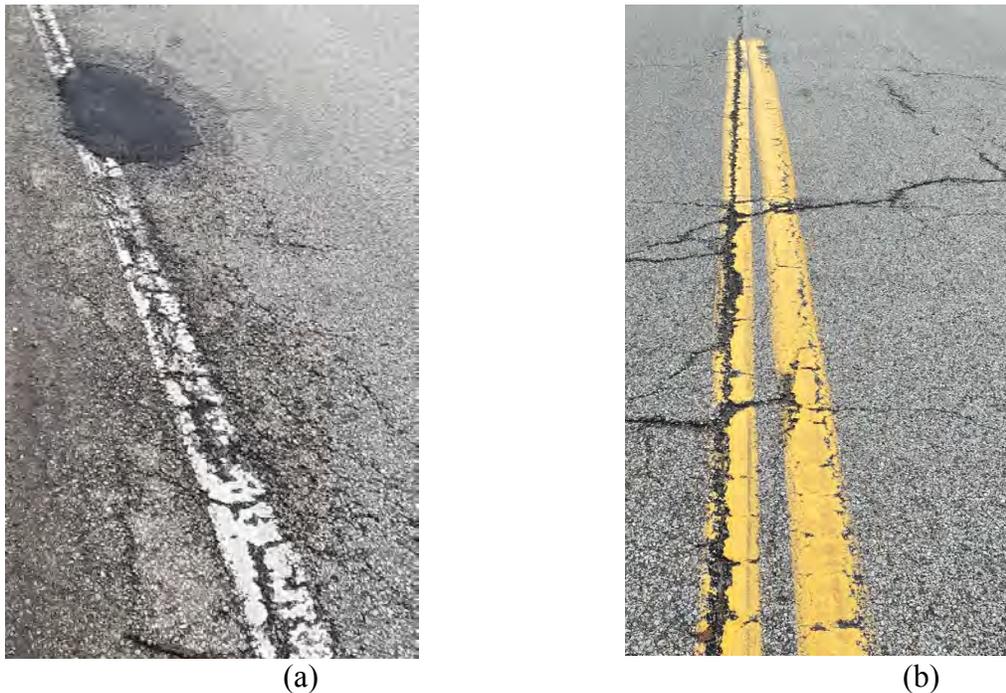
(a) cracking and potholes in the pavement shoulder joint and (b) cracking at the longitudinal joint
